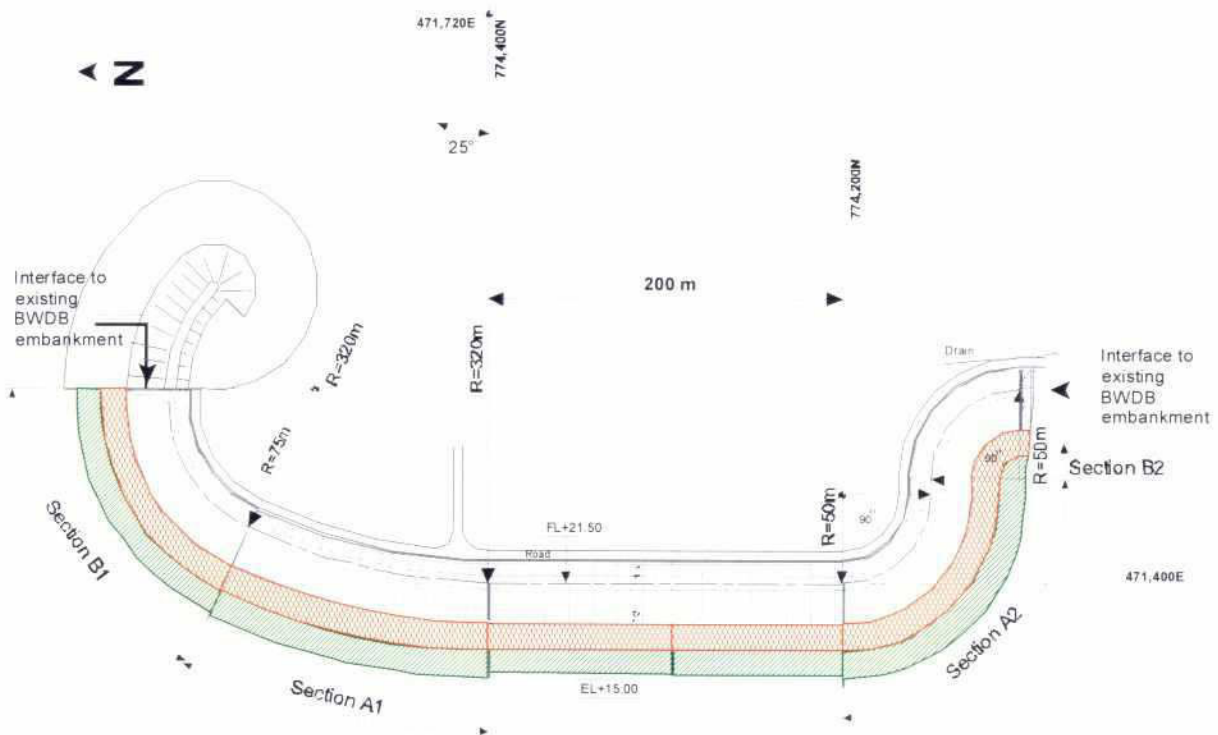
Plan view of the Ghutail Revetment Test Structure
